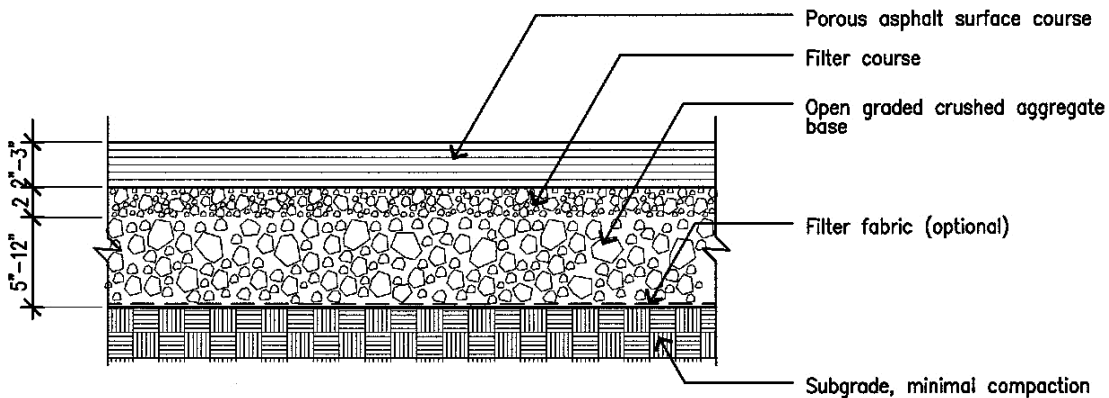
Porous Asphalt Installation (Source: BASMAA, 1999)
